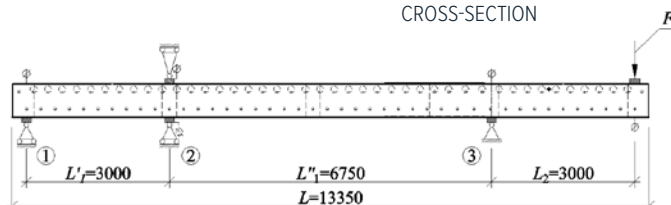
STATIC SYSTEM OF THE CANTILEVER TESTS
